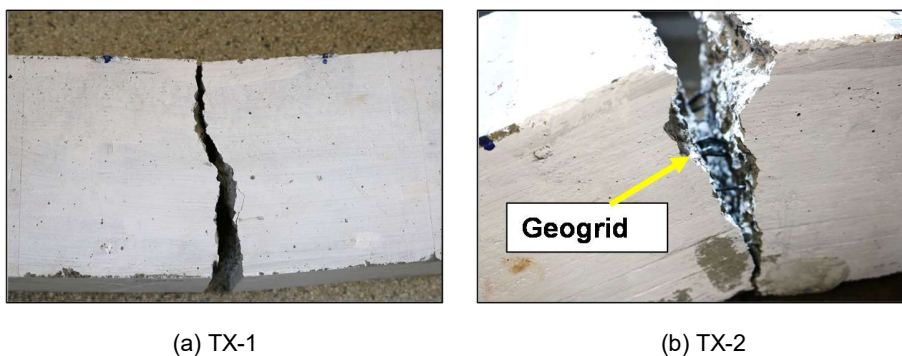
Stretching of the triaxial geogrid after reinforced-concrete beams failure.
